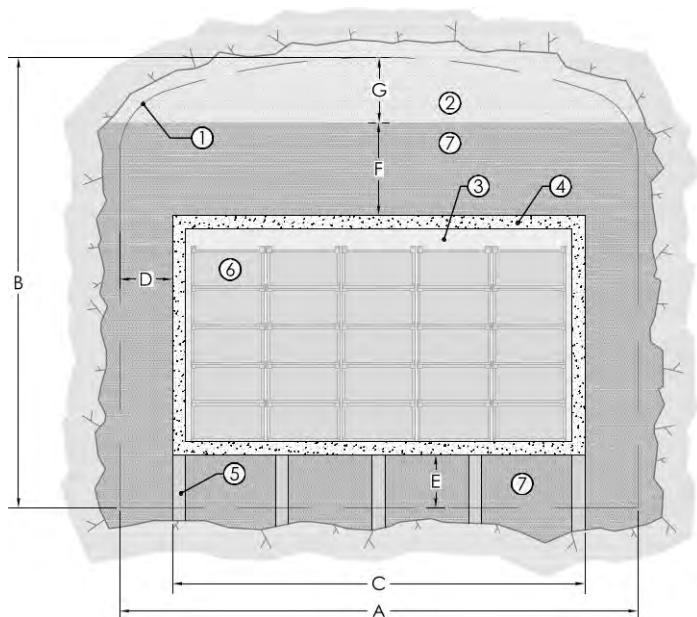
Schematic cross section through the BHA vault according to Elfving et al. (2013). Numbers indicate (1) tunnel contour, (2) bentonite pellets placed as backfill in crown space, (3) grouted void space inside caisson, (4) concrete caisson wall (0.5 m thick), (5) granite pillars, (6) waste packages, and (7) bentonite blocks. Nominal dimensions according to the design are A = 20.6 m, B = 18.5 m, C = 16 m, D = 2.3 m, E = 2.4 m, F = 4 m, and G = 3.7 m.
